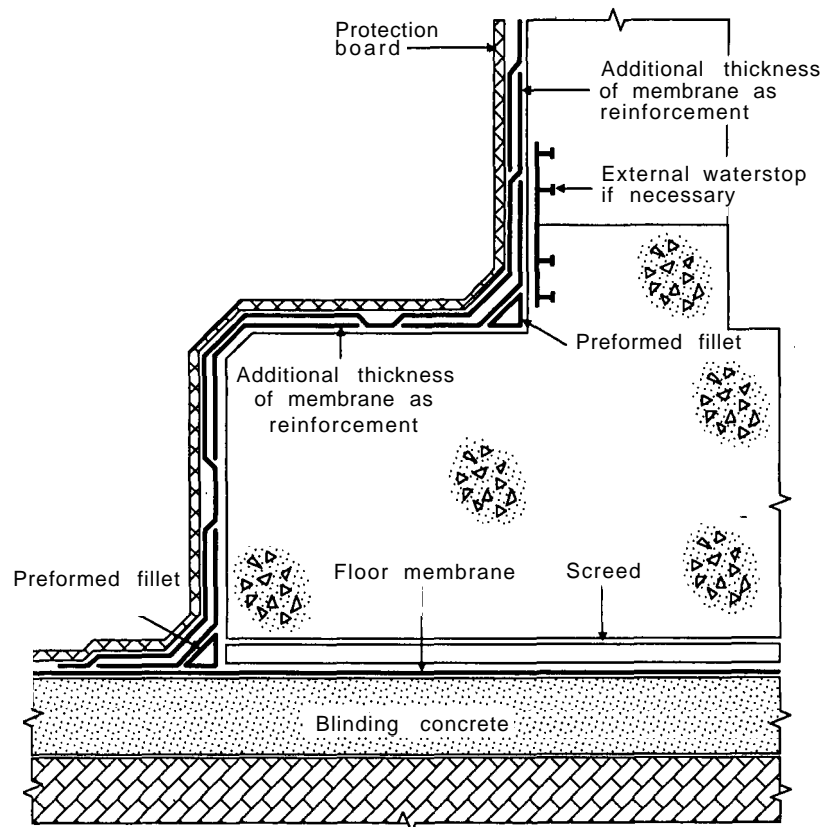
Example of jointing between floor and wall; external tanking membranes (Type Ae)
